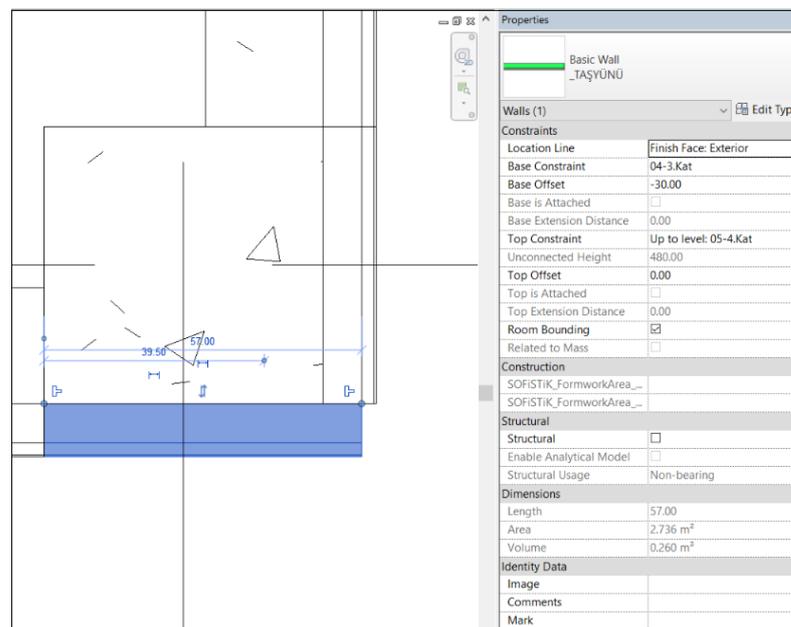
An Improper Joint of Insulation Elements in 2D Plan
